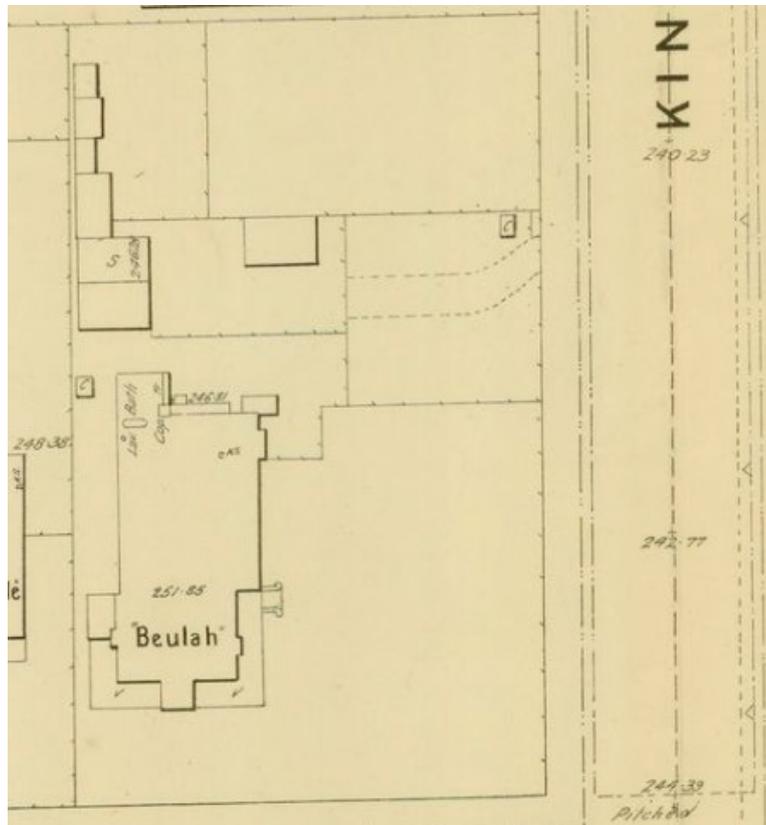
'Beulah' in 1904. (Source: MMBW Detail Plan No. 1858)
